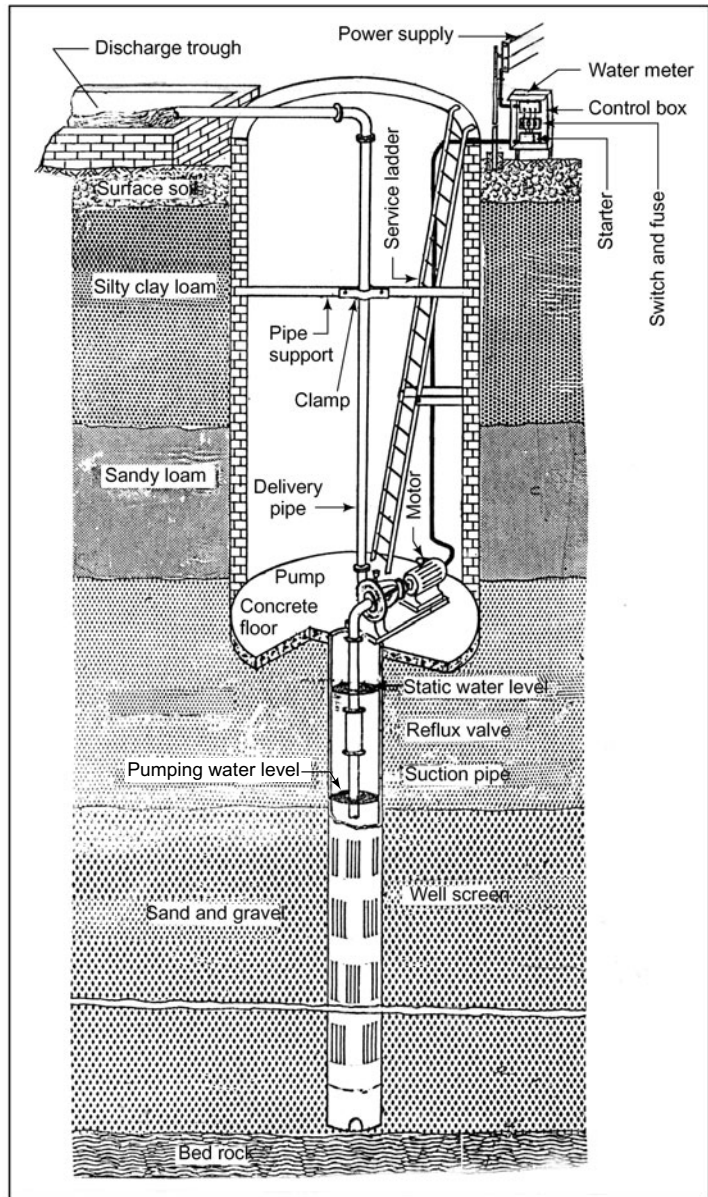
Partially exposed view of a motor-driven volute centrifugal pump installed in a tube well provided with dry sump to keep the pump within its suction limits
